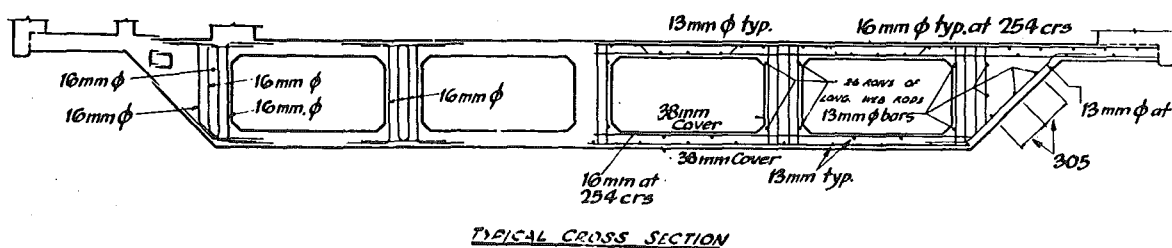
REINFORCING DETAILS OF PORIRUA STATION OVERBRIDGE
